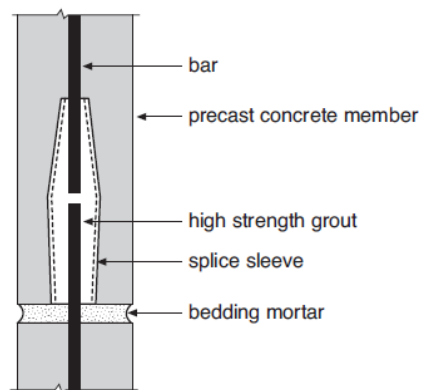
Example of an early grouted sleeve joint between precast concrete wall panels (excerpt from CAE 1999)
